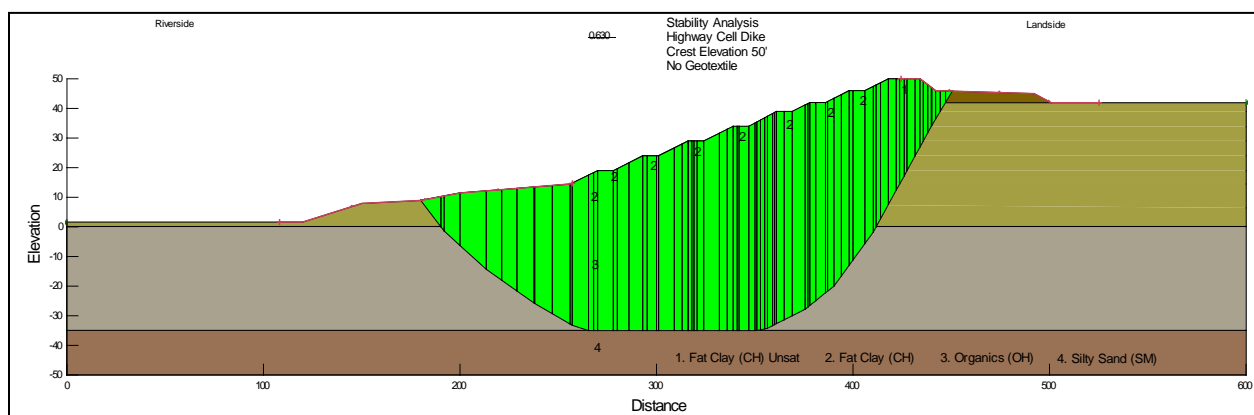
Highway Cell. Elevation 50'. No Geotextile. FS = 0.630
